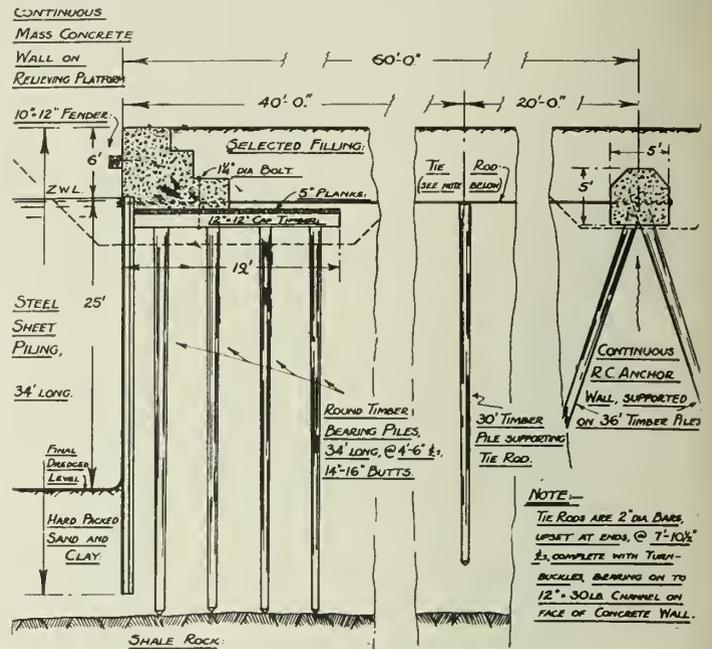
Steel Pile Wharf Wall, showing Relieving Platform.
